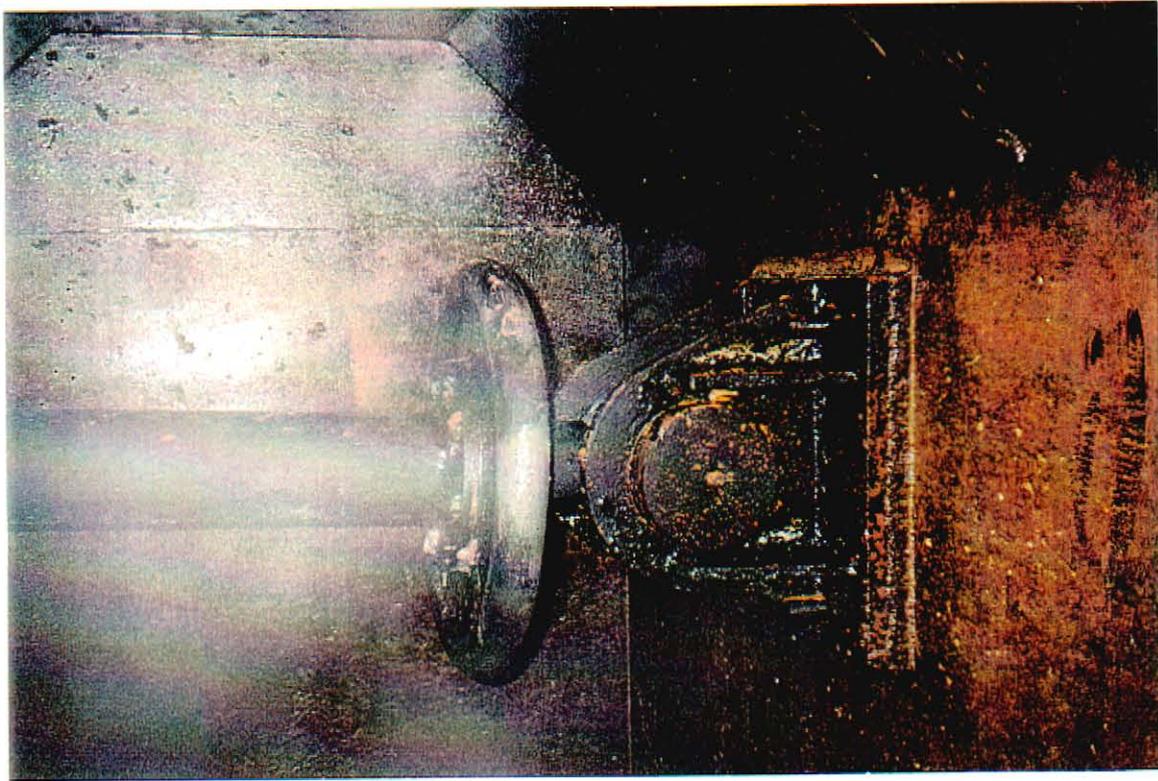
DOGGING DEVICE SCREW, WEST END
